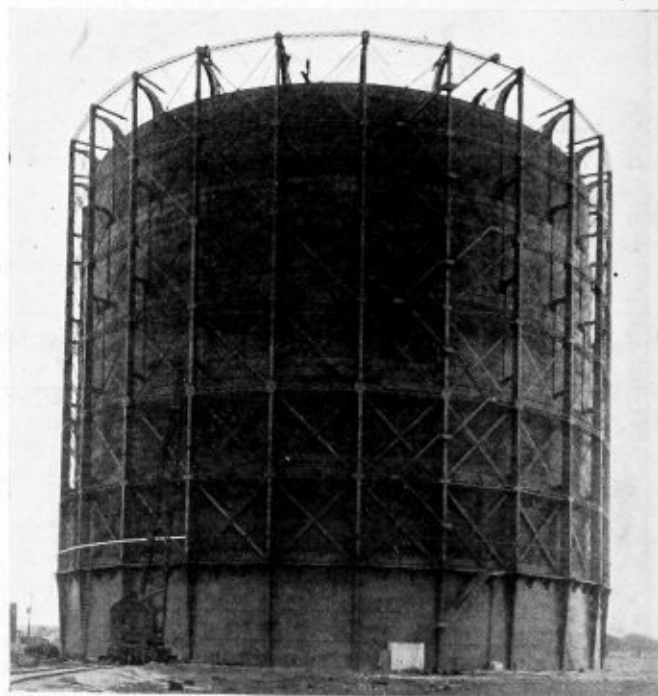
6,000,000-Cubic Foot Gas Holder Completed
